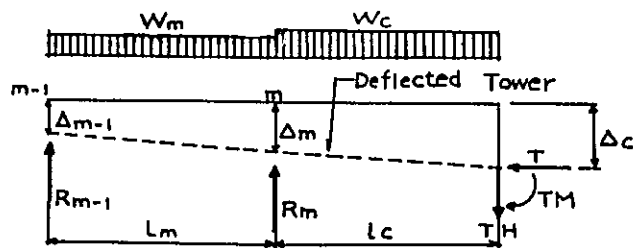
LOADS ON CANTILEVERED SPAN OF TOWER
